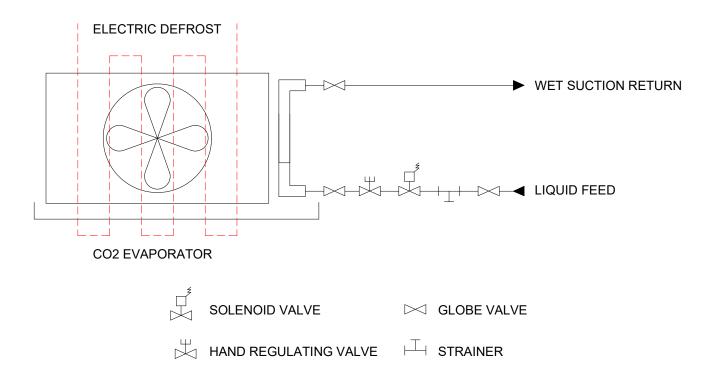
Control Valve Group for Bottom Feed Pumped CO2 Evaporator. Multi-Temperature Levels. Electric Defrost.
